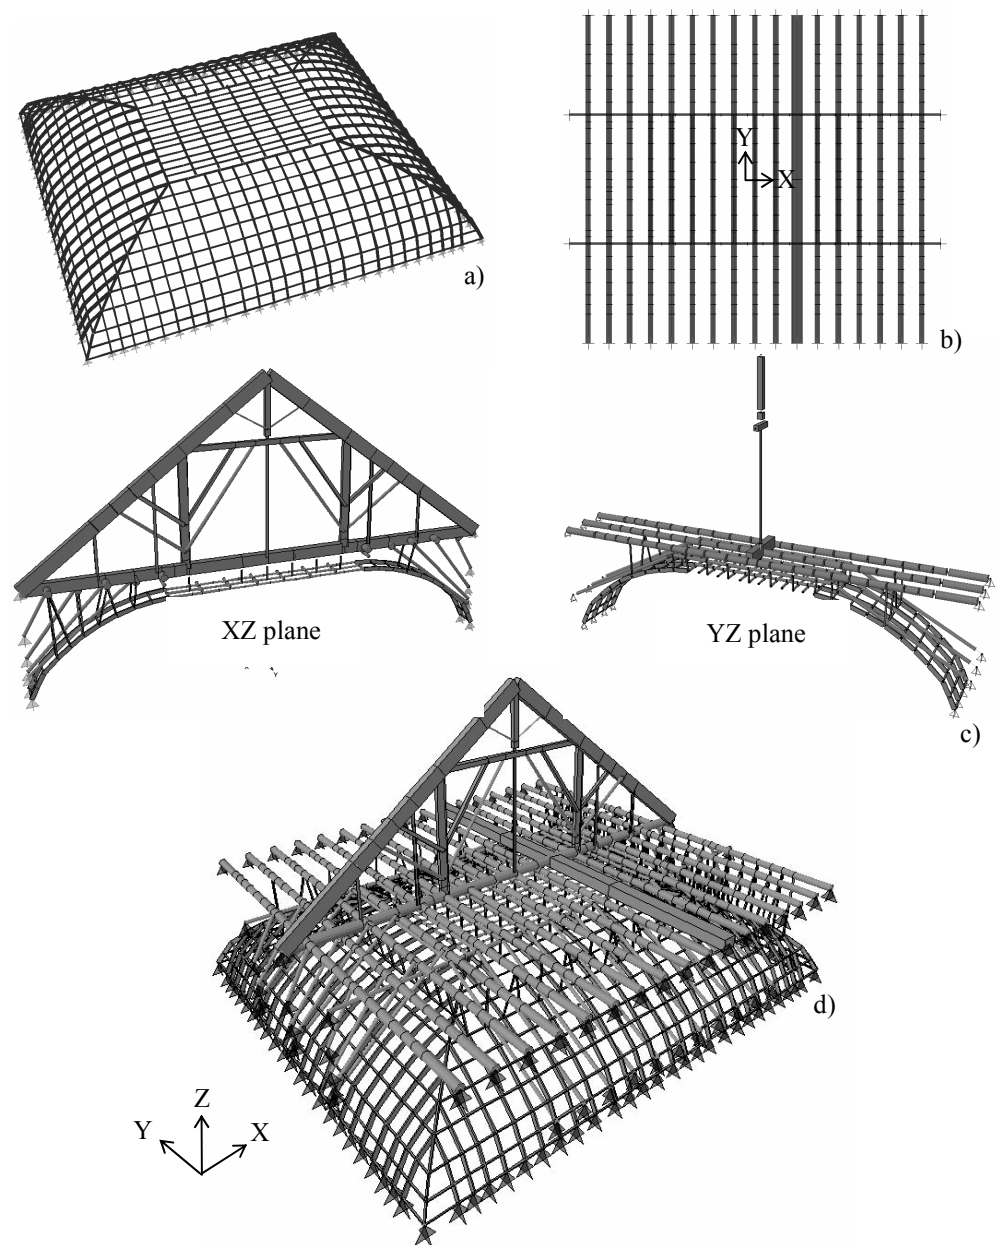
Diplomatic Hall (II) – Structural modelling: a) Vault; b) Floor beam; c) XZ and YZ planes; d) 3D model.
